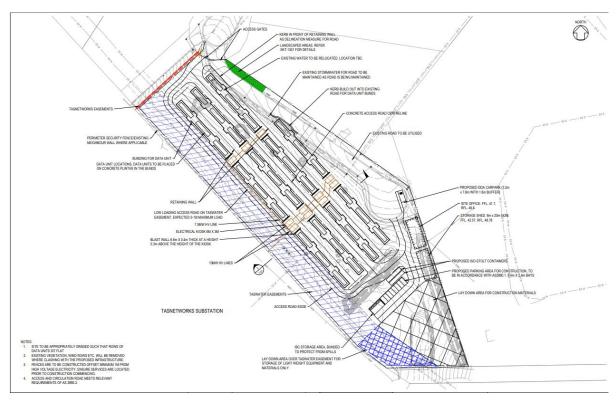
Schematic design and general arrangement (source: pitt and sherry schematic design report, 2024)
